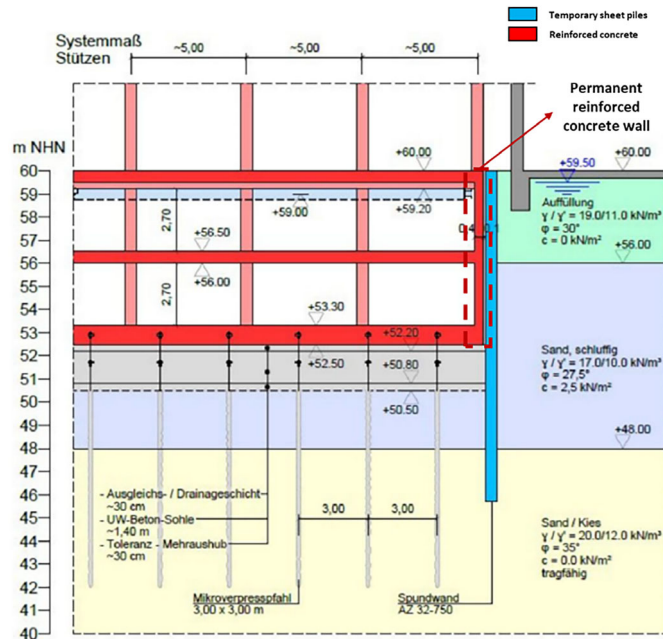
Temporary steel sheet pile wall and reinforced concrete permanent wall
